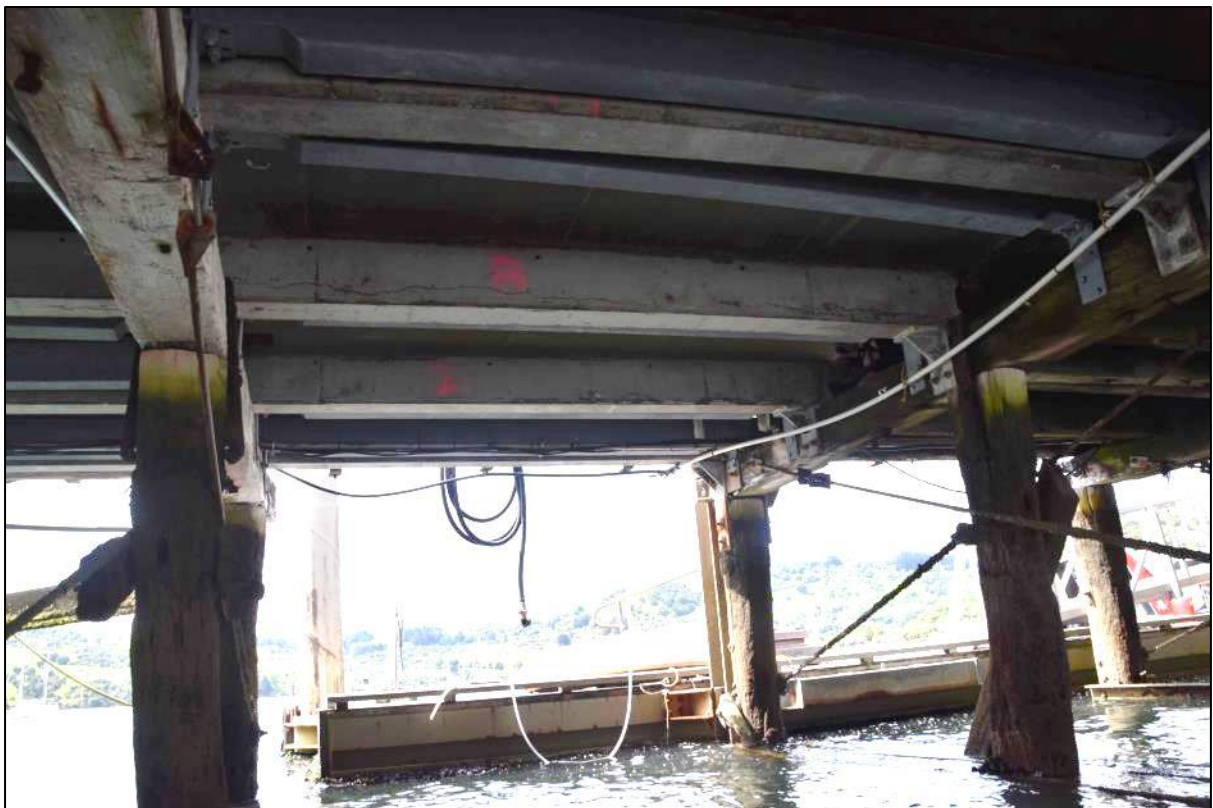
A close-up of inserted concrete and steel beams (Photo 40) – some of the concrete beam are cracked. Poorly restrained and concealed modern conduits.
